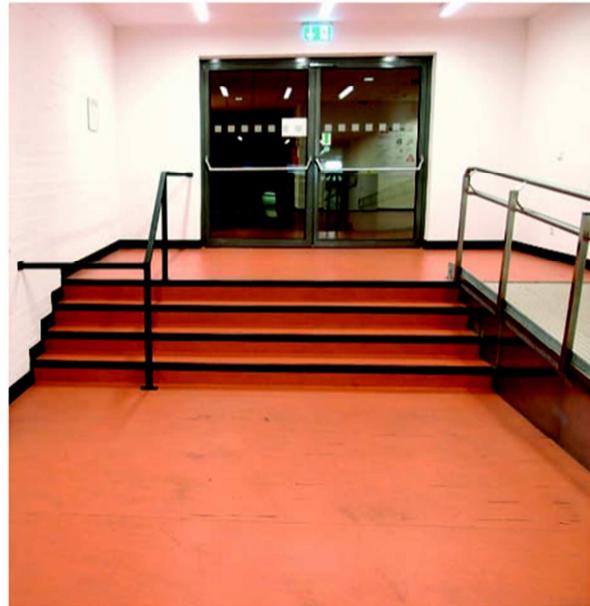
shows a positive example of indoor stairs with high-contrast step markings made of hard rubber on a linoleum floor.
